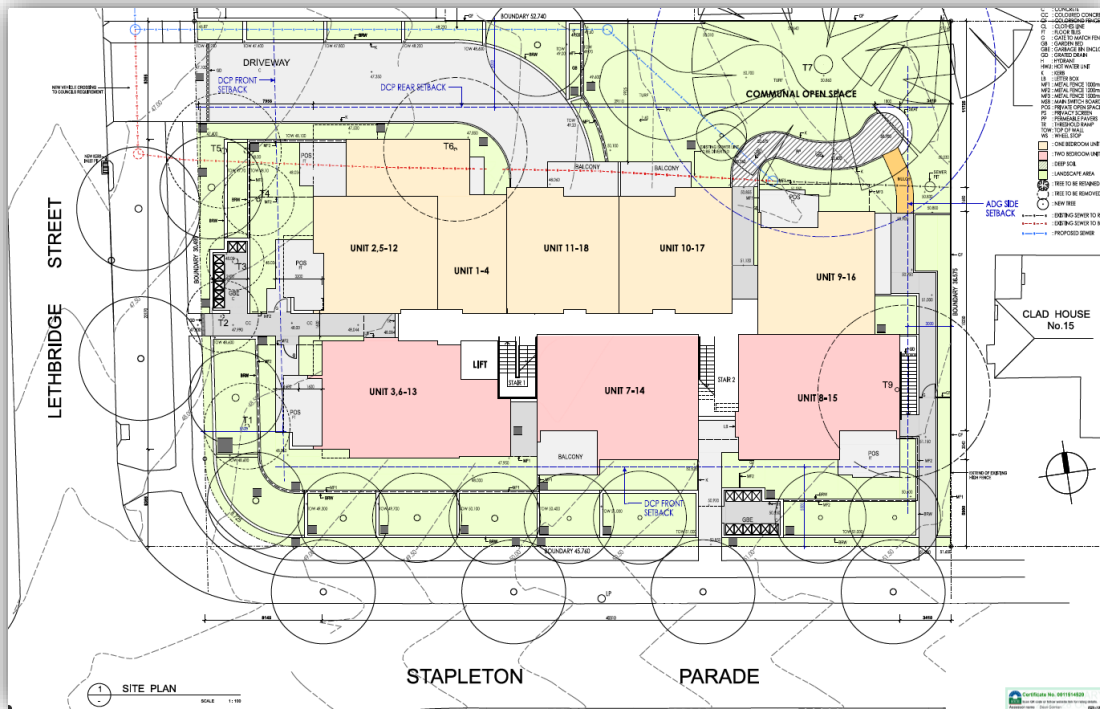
Extract from Architectural Plans – Site Plan (Source: DKT Architects, September 2024)
